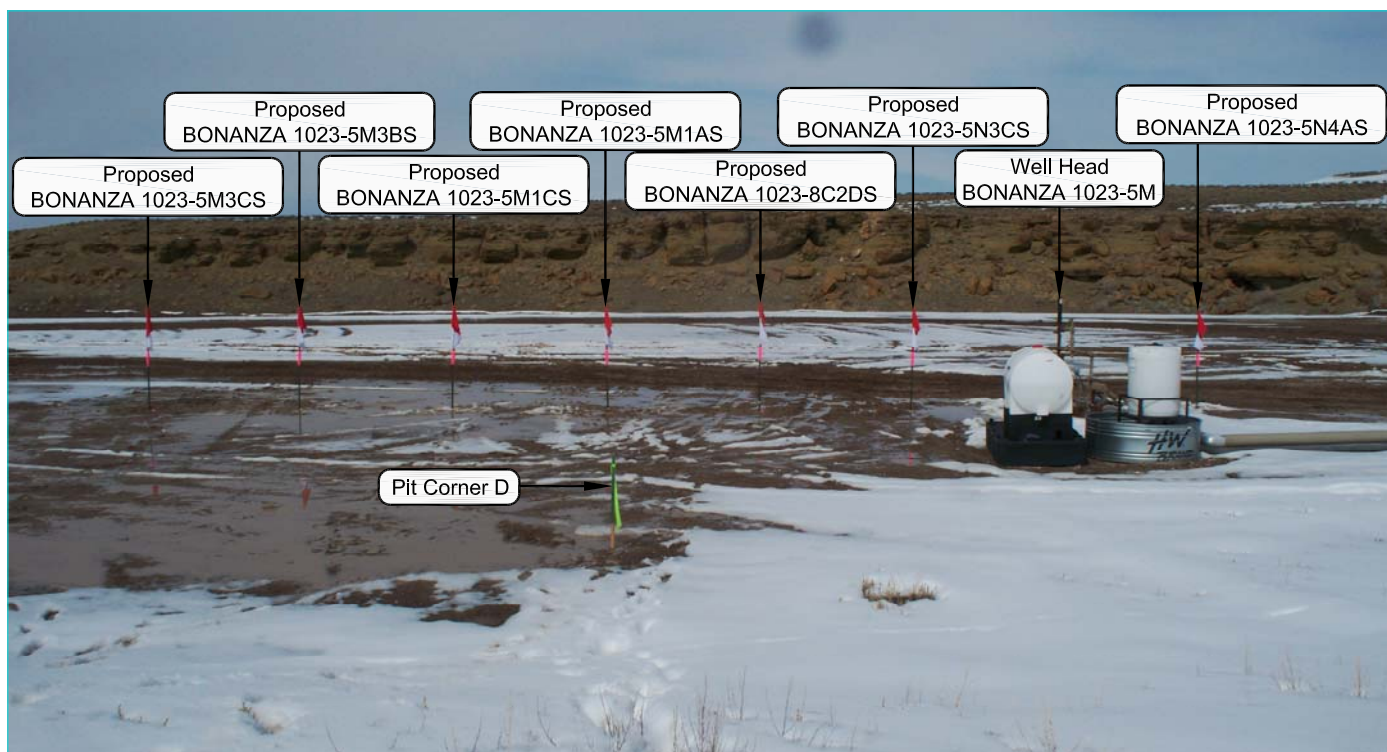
PHOTO VIEW: FROM PIT CORNER D TO LOCATION STAKE
